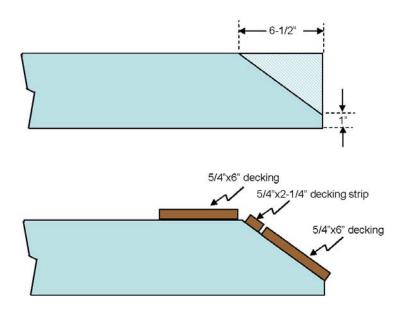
Details of Construction that Requires Joining of Two Sections at an Angle
